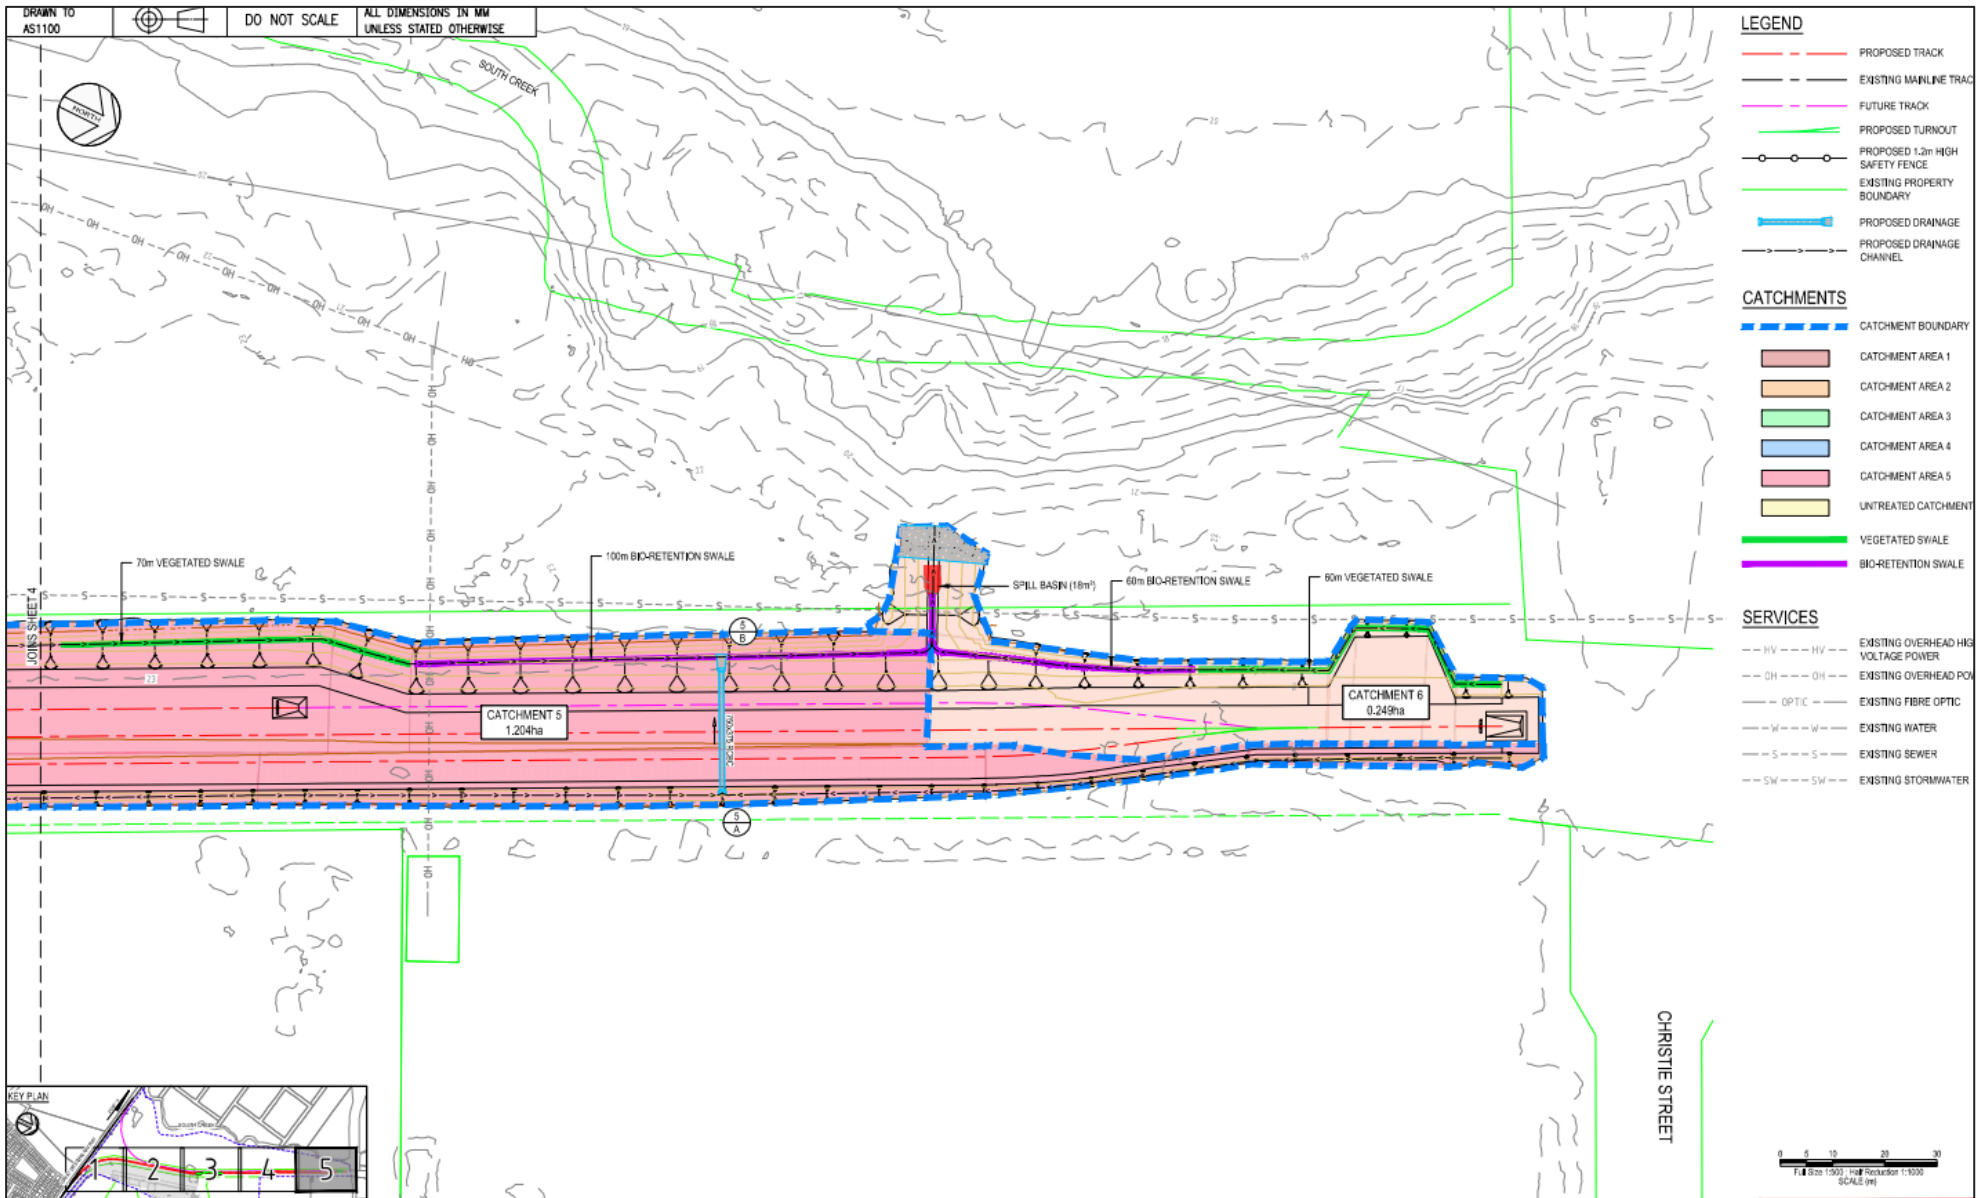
| Proposed stormwater infrastructure for northern section of rail refurbishment works (Source: Applicant's Stormwater Management Design)
